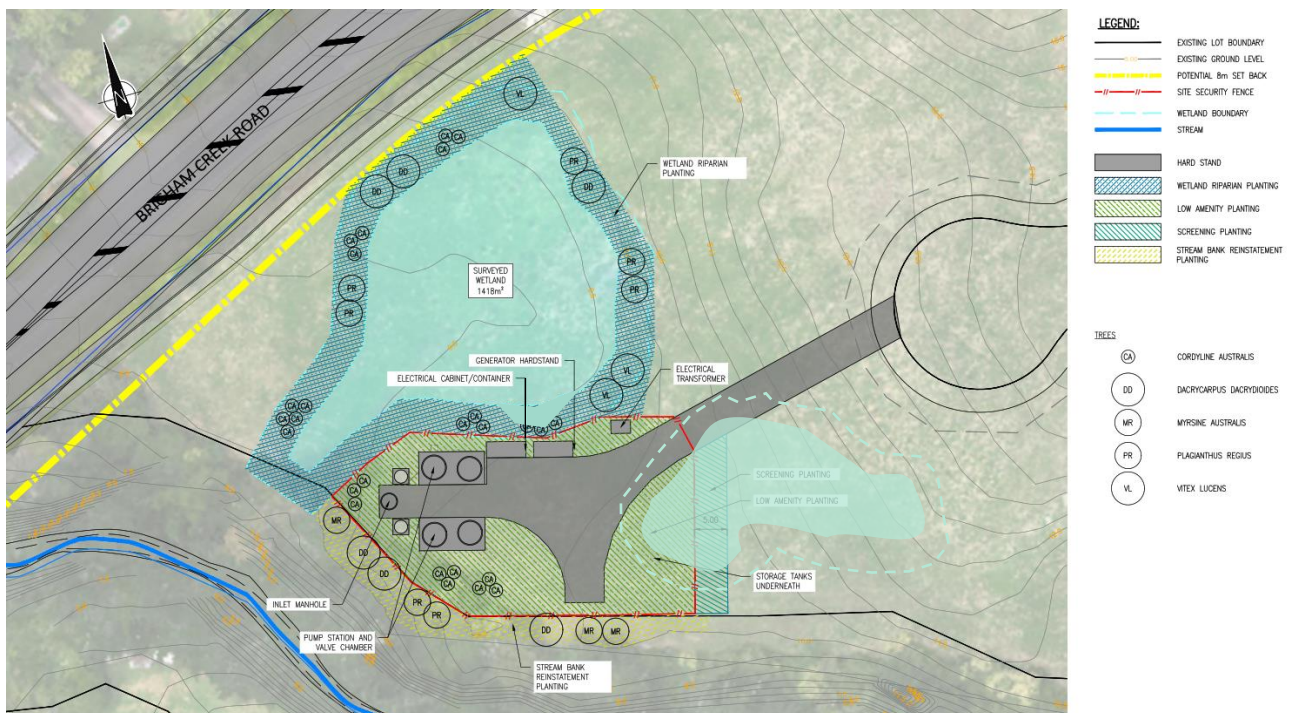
Indicative pump station landscape plan (snip from Drawing 2013646.001, WSP GHD, provided in Appendix A)
